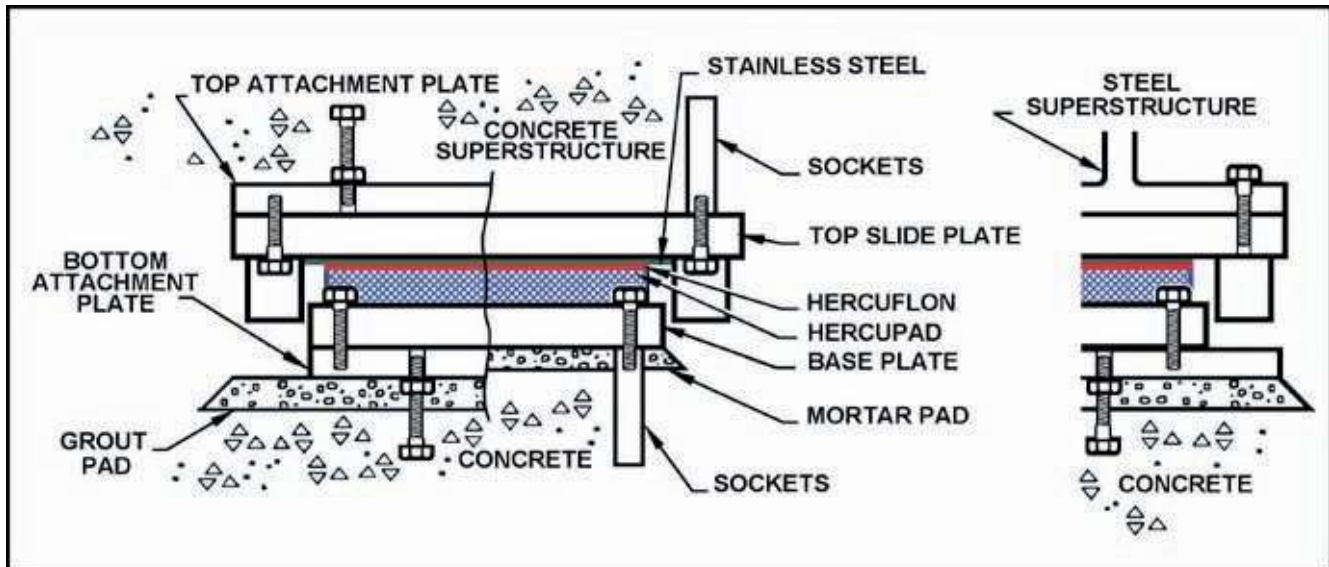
Installation of HLD/SG Bearing in a Concrete Structure
